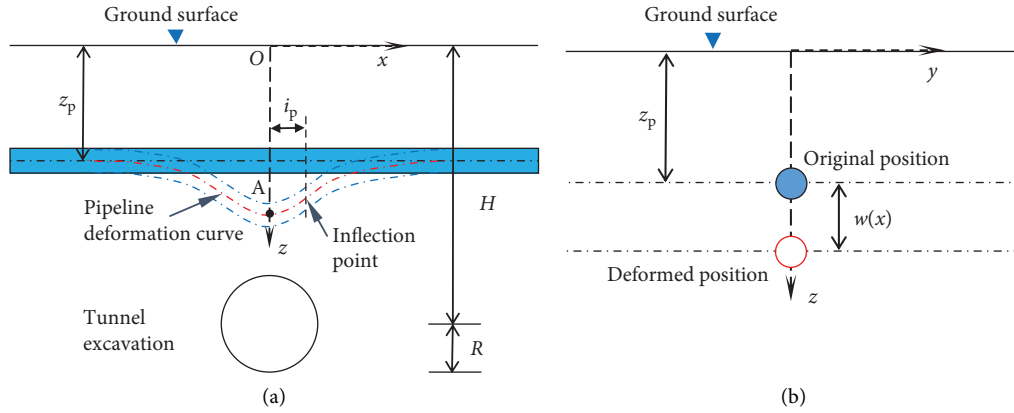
Deformation calculation diagram of pipeline during tunnel excavation. (a) In the x-z plan and (b) in the y-z plan.
